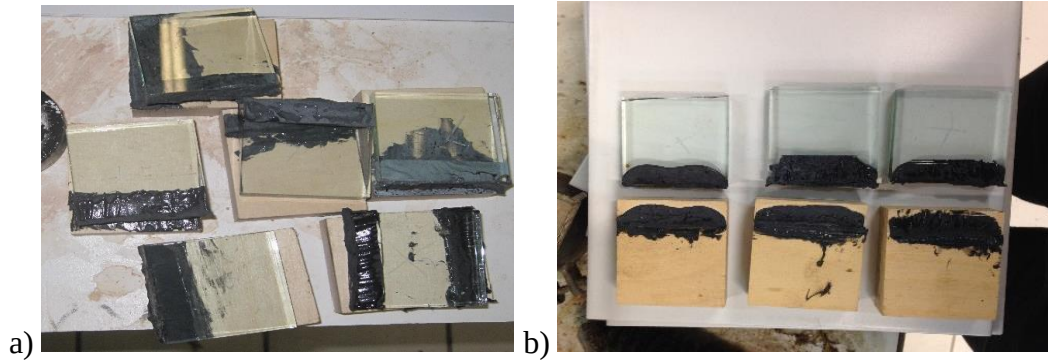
, b: a) mixed breakage-failure in adhesion to timber and cohesive failure in adhesive (wetting-drying) b) cohesive failure in adhesive (freezing-thawing)
